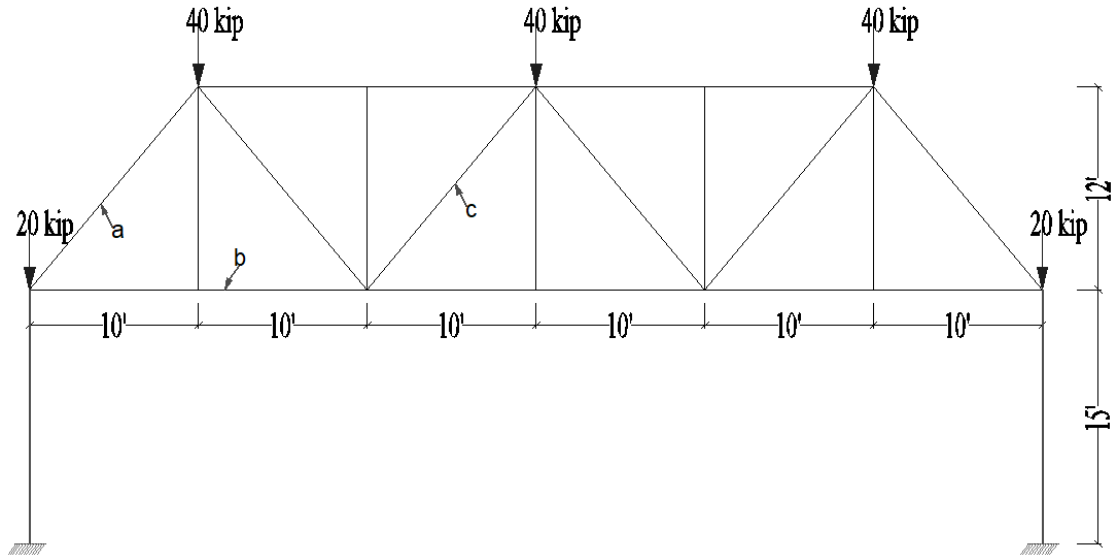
Two Dimensional View of the Bridge Truss (Pratt Type)
